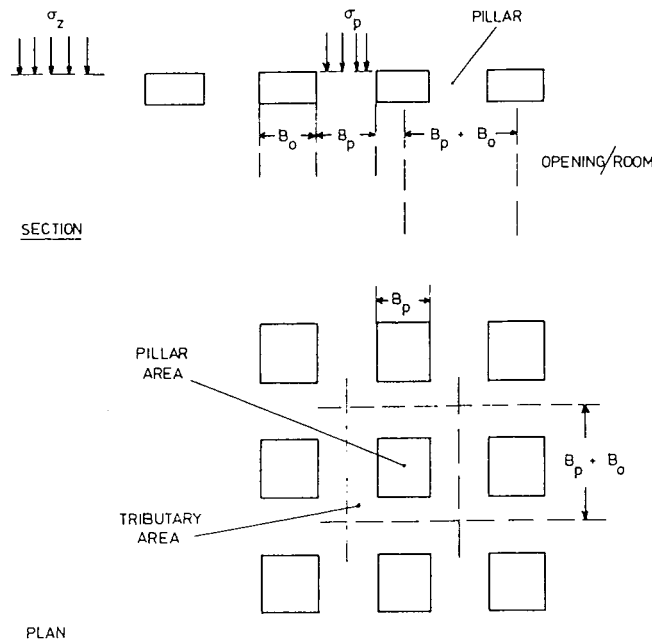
Section and plans of rooms and pillars with widths and dimensions for simple analysis.
